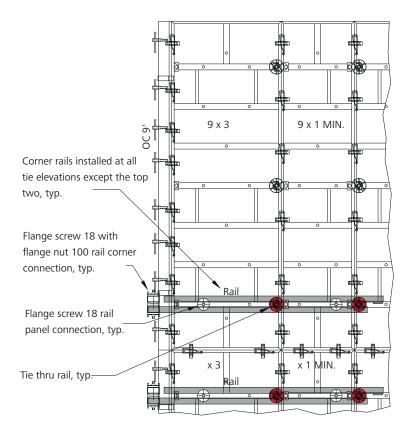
Walls > 18" but \leq 24" thick - example corner elevation
